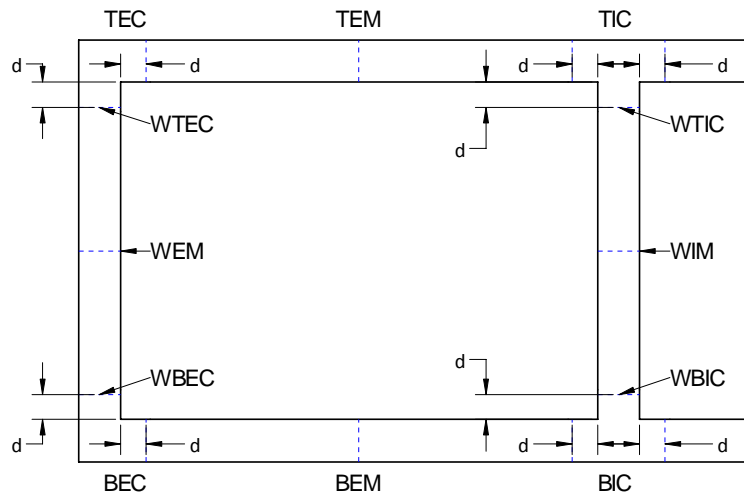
A SHEAR CRITICAL SECTIONS FOR CULVERTS WITHOUT HAUNCHES.
